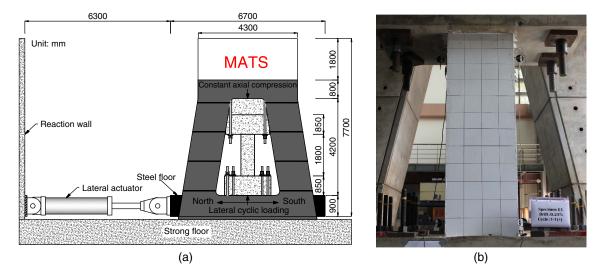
(a) Multiaxial testing system (MATS); and (b) photograph of the test setup.
